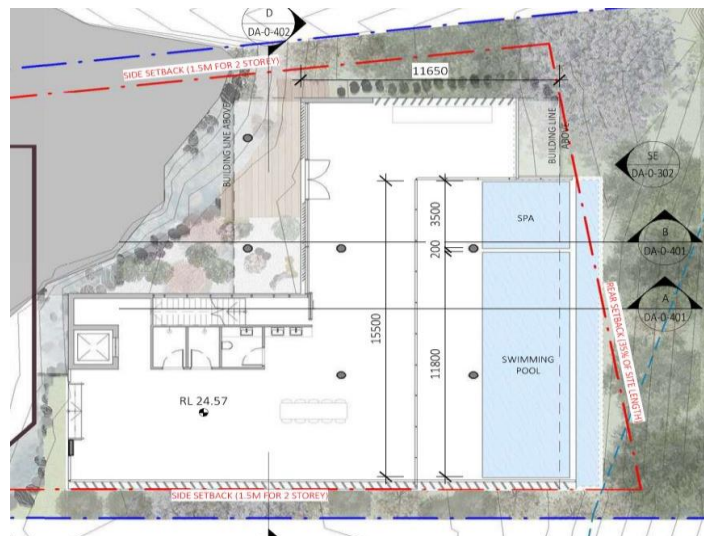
Lower module GF plan 8.2 Review (Source: Plans from applicant)
